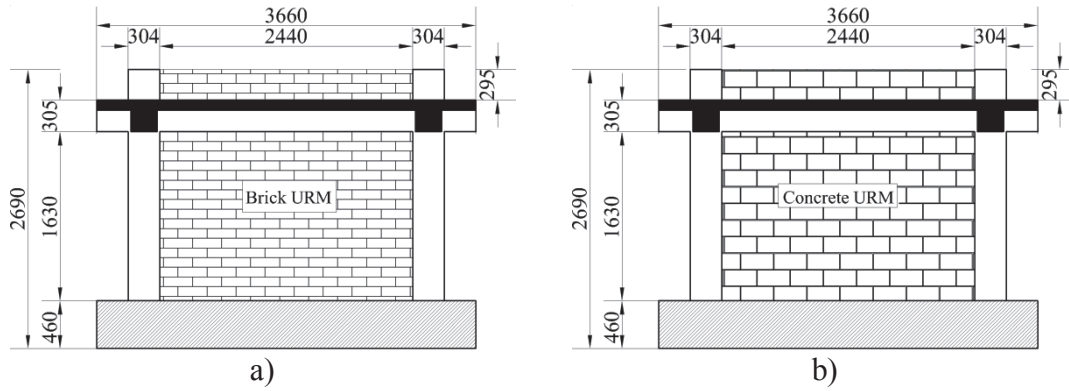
Infilled frame specimens tested by *Angel (1994)*: a) brick masonry infill, b) concrete unit masonry infill
